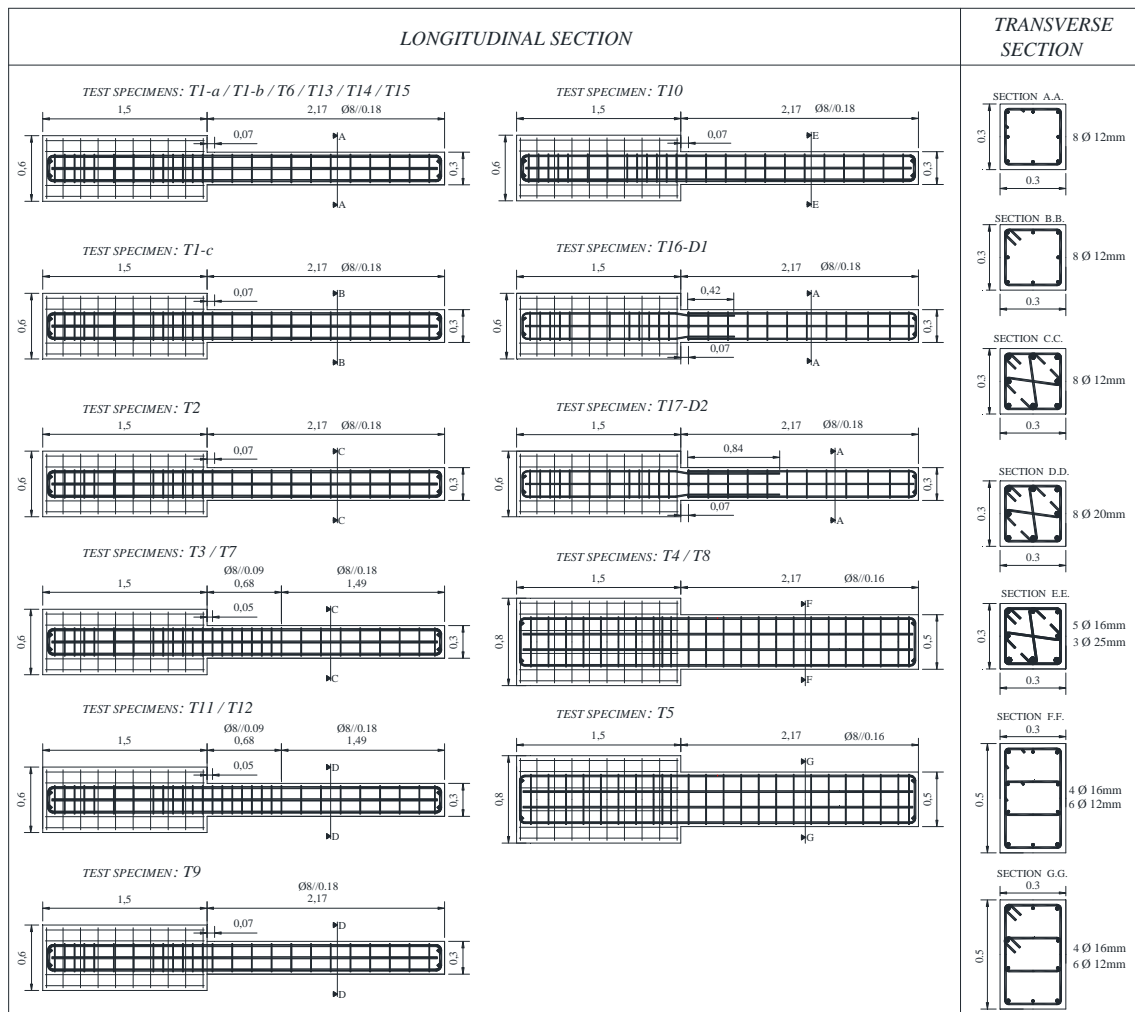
Longitudinal and transverse sections showing the detailing and geometry of the column specimens.
